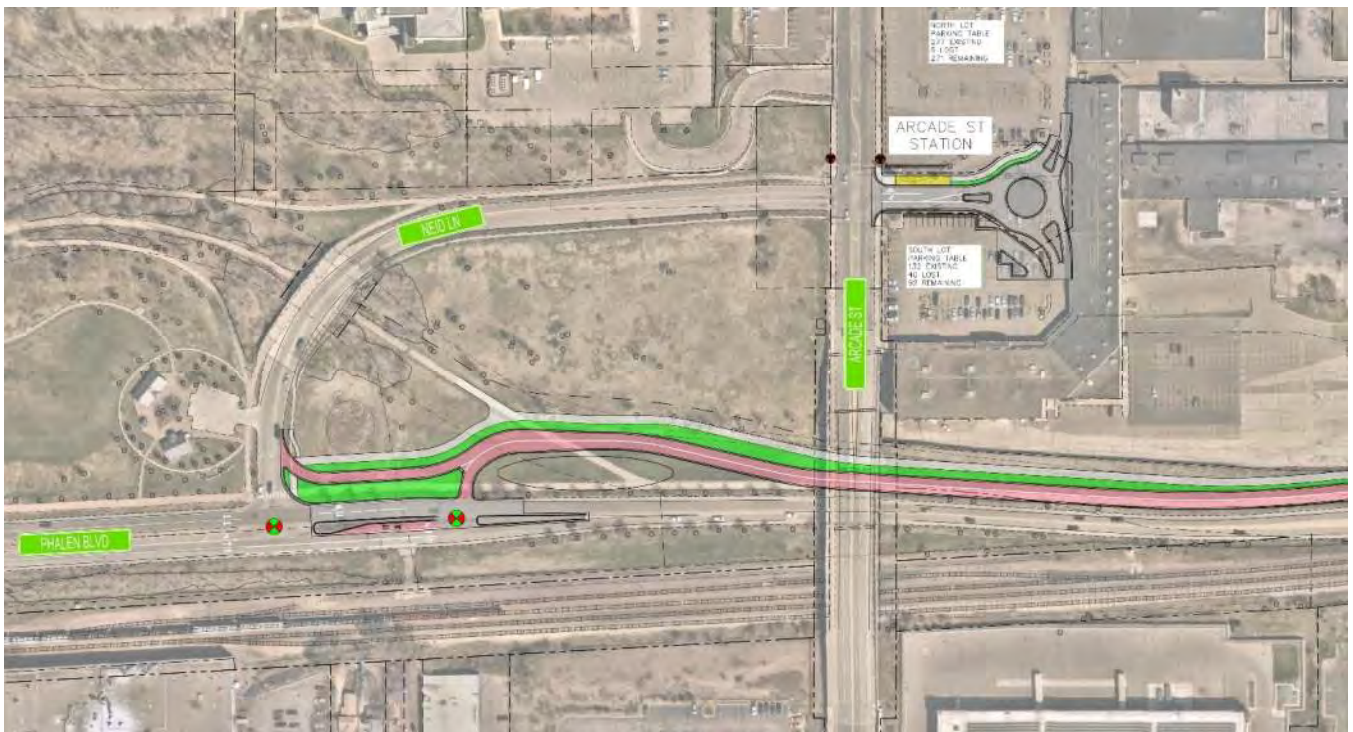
Alternative Concept E Layout (one platform with roundabout bus turnaround/property access)
